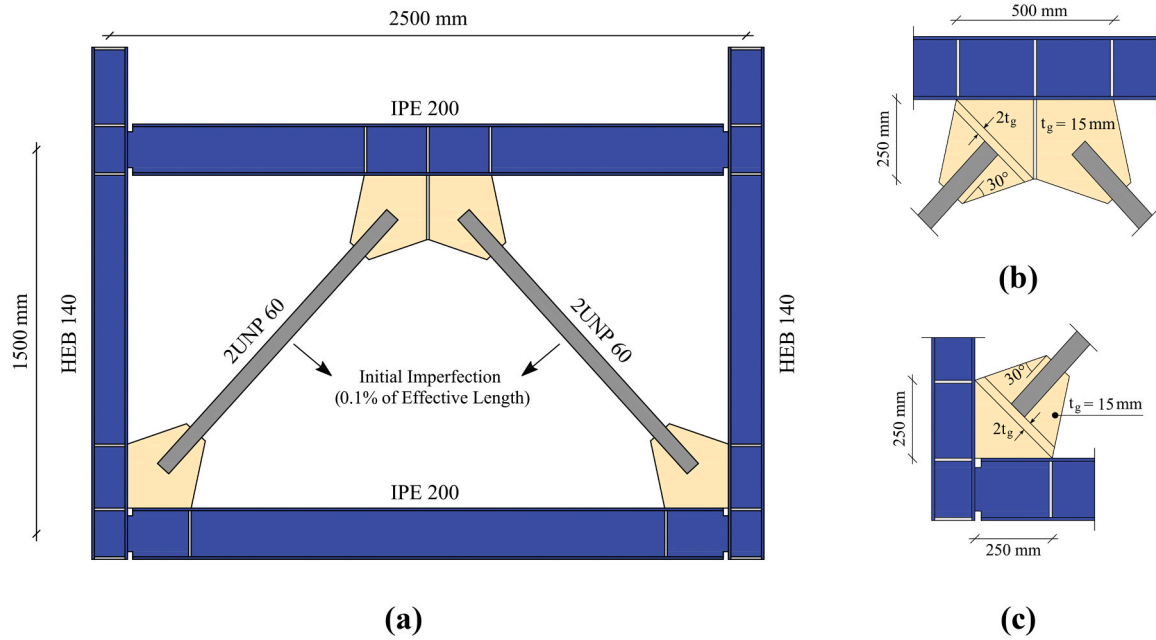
Inverted V-braced frames (IVBFs); (a) elevation view, (b) mid-span gusset plate, (c) corner gusset plate.
